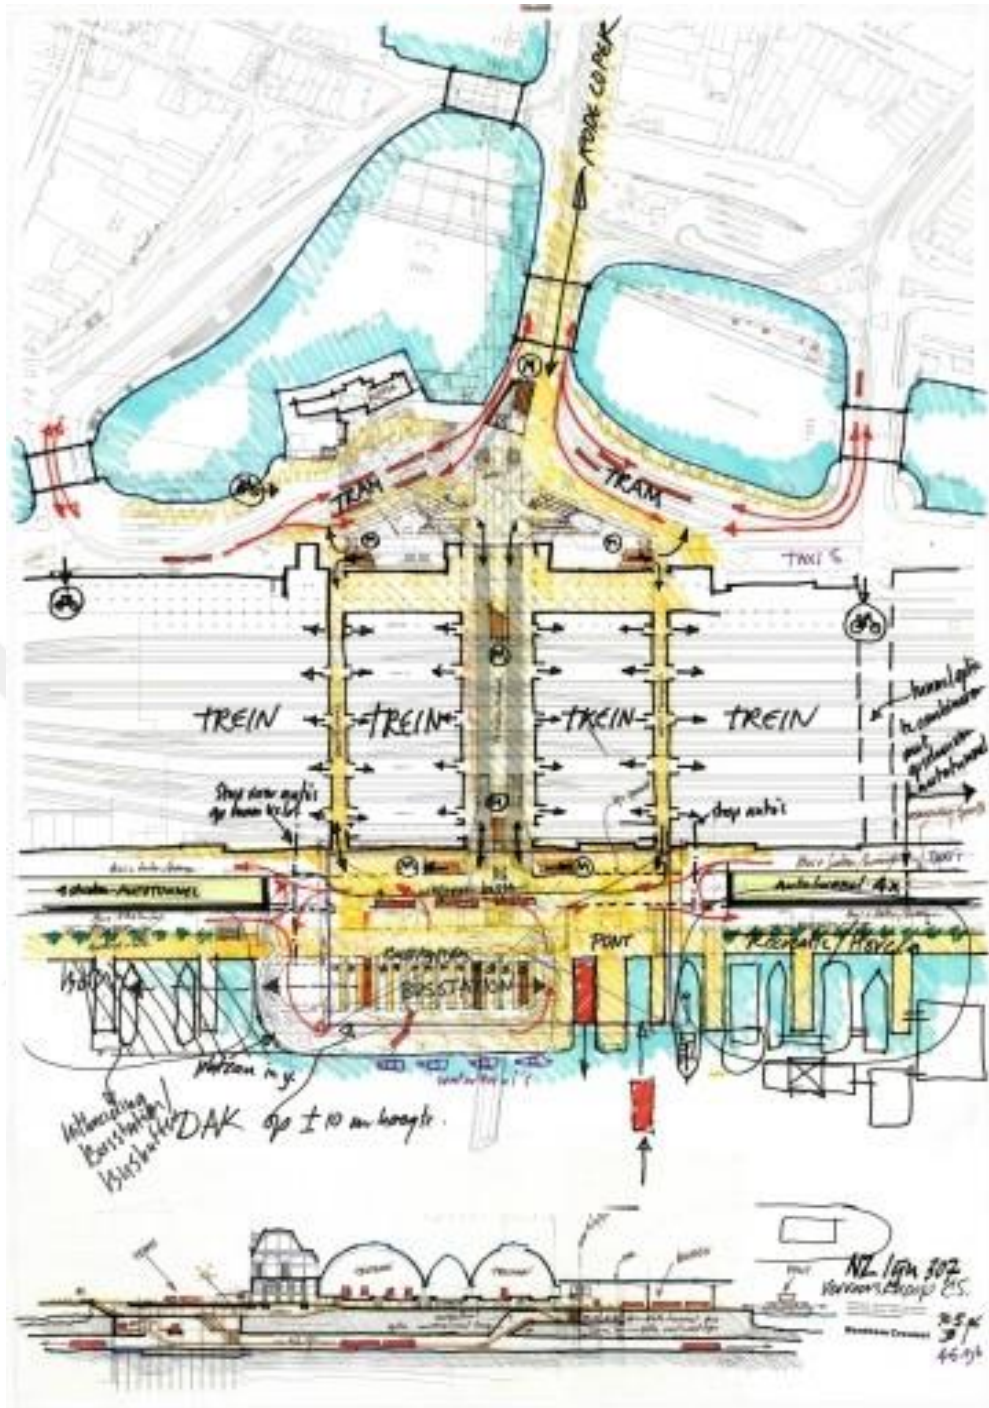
First sketches of master plan design phase (Bentham Crowel Architects).
